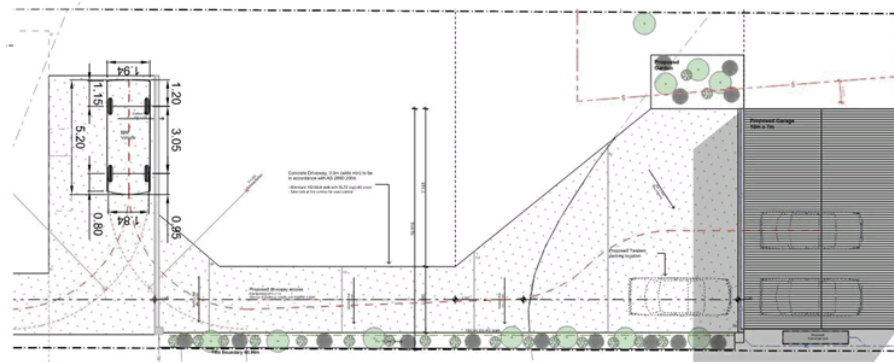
Onsite parking and turning plan(Apogee, 2021)
